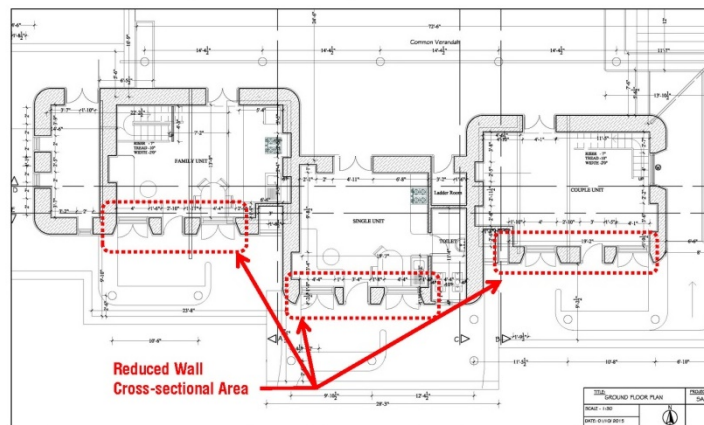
Overall plan of the three prototype buildings, showing the sections on the south facades where many openings have reduced the bearing area of the walls
